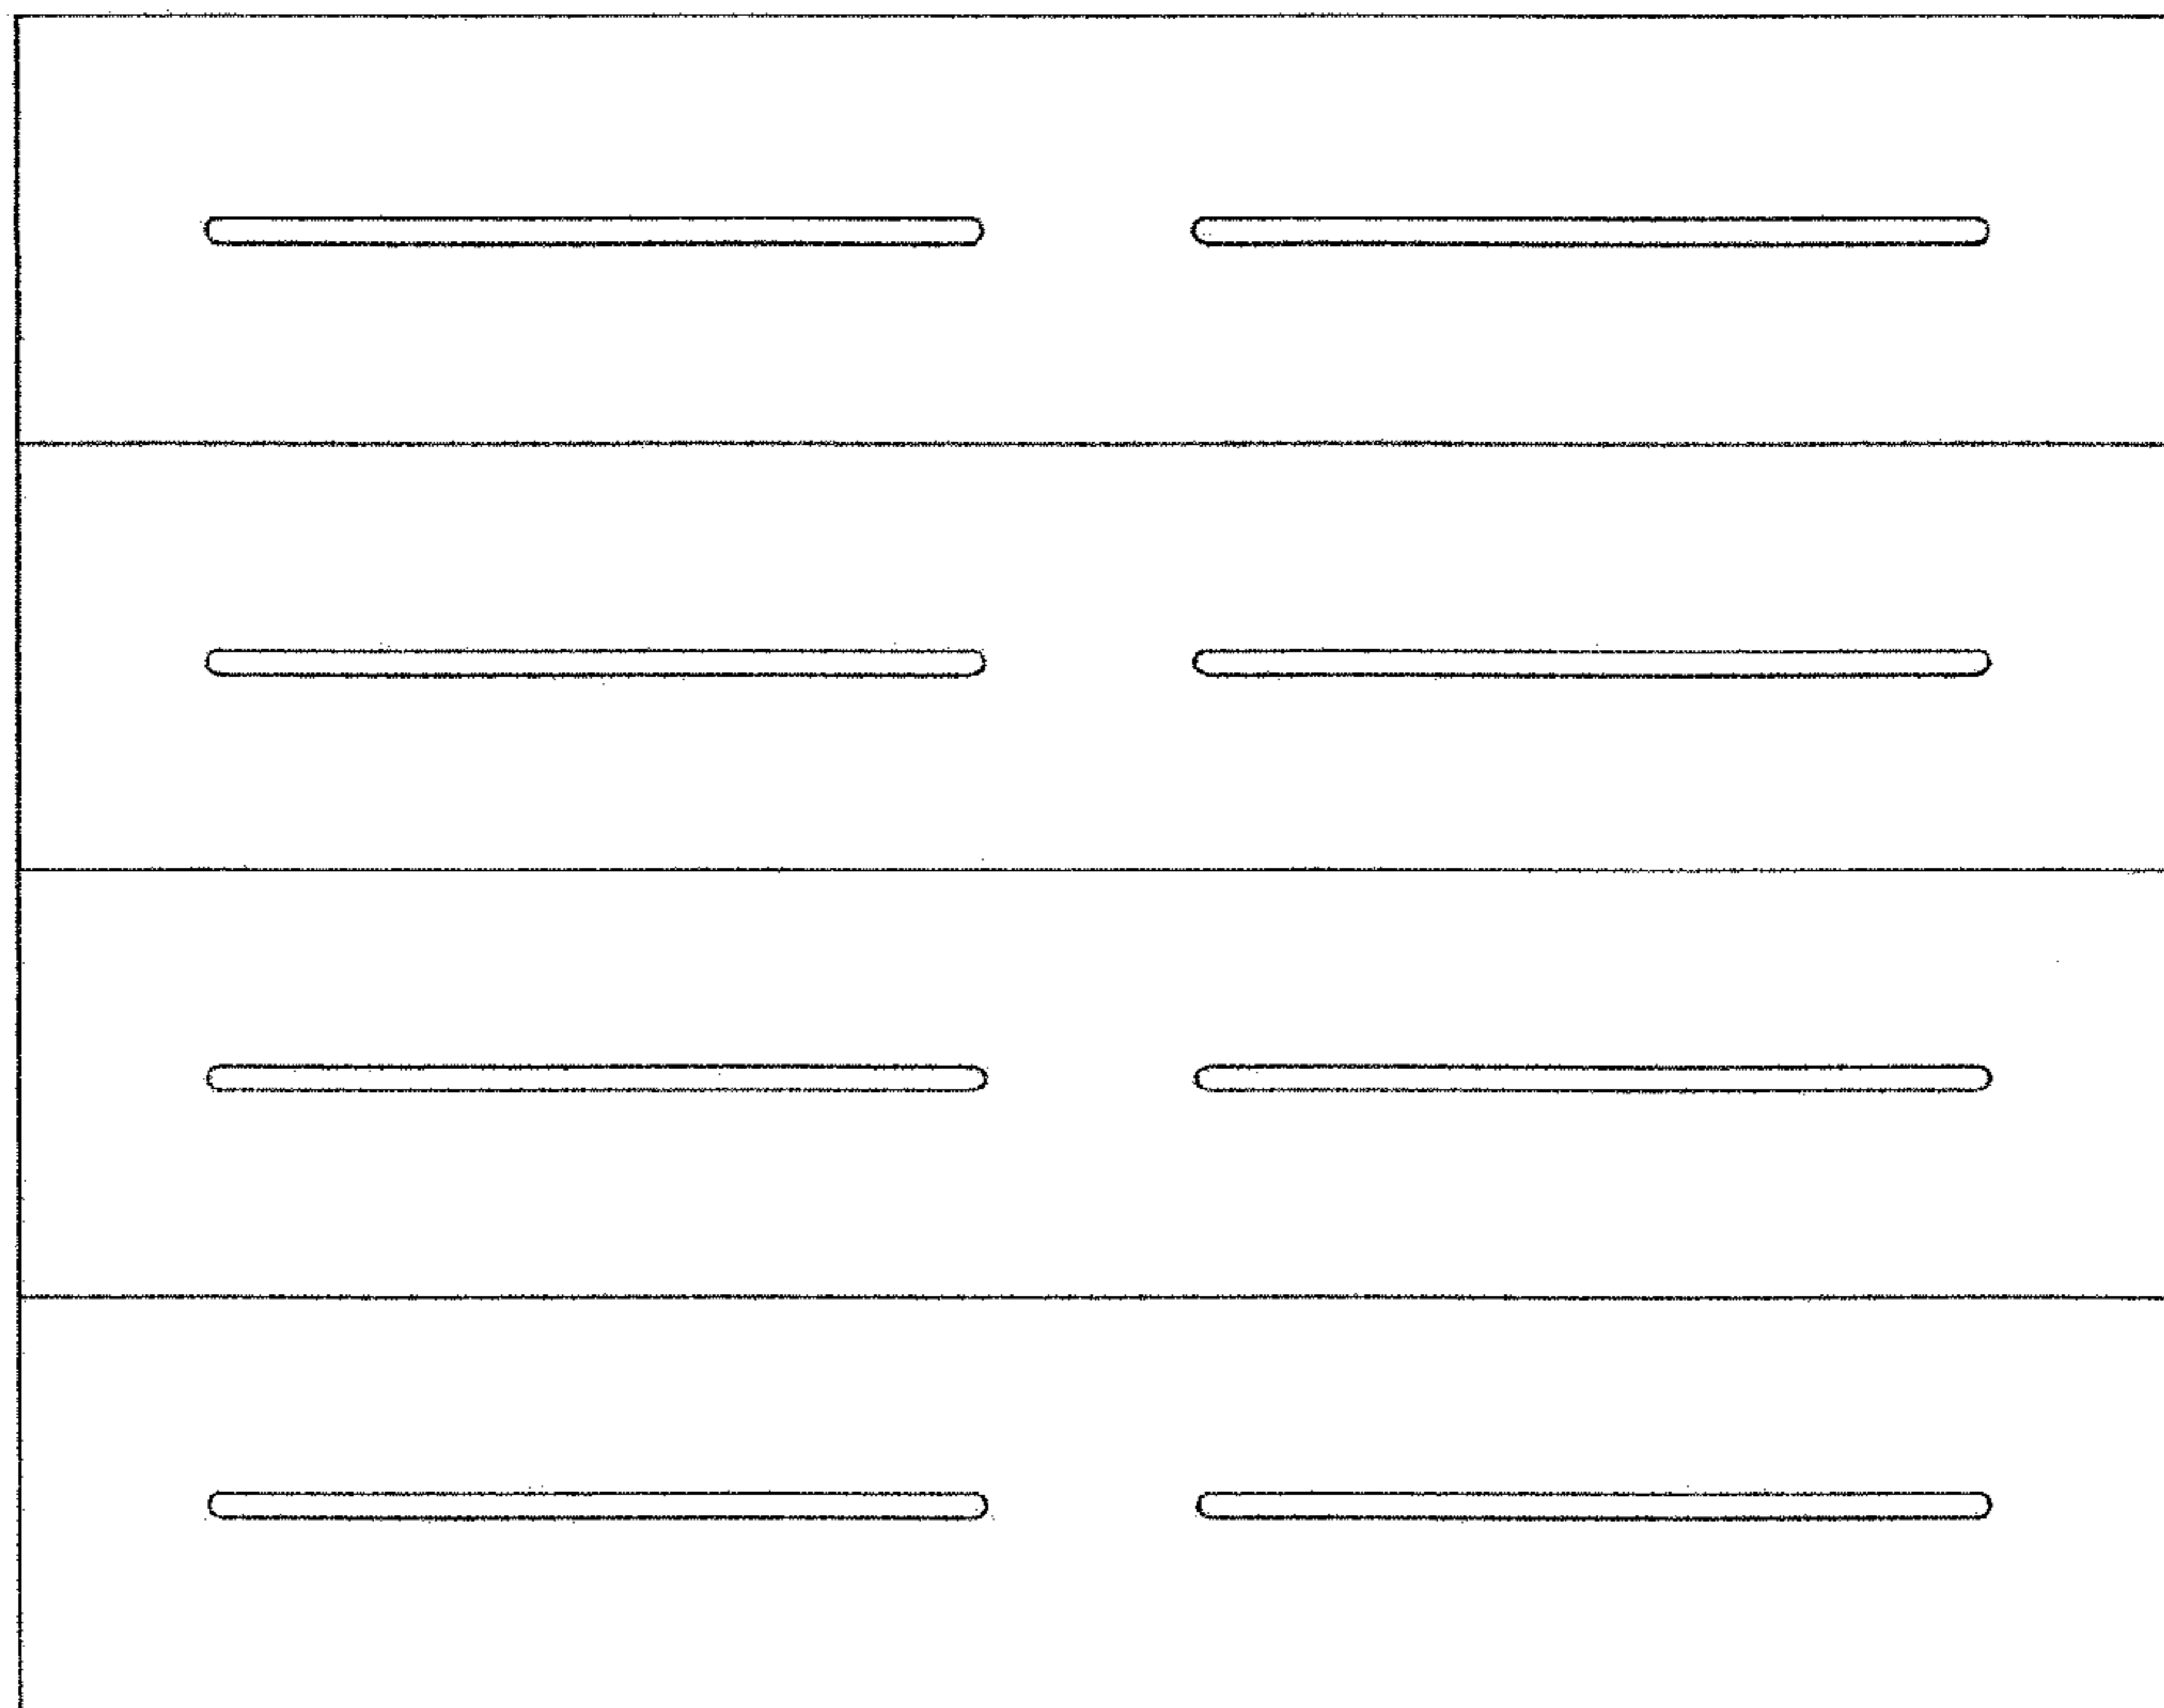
is a front elevation view of a sectional garage door that includes four panels;
